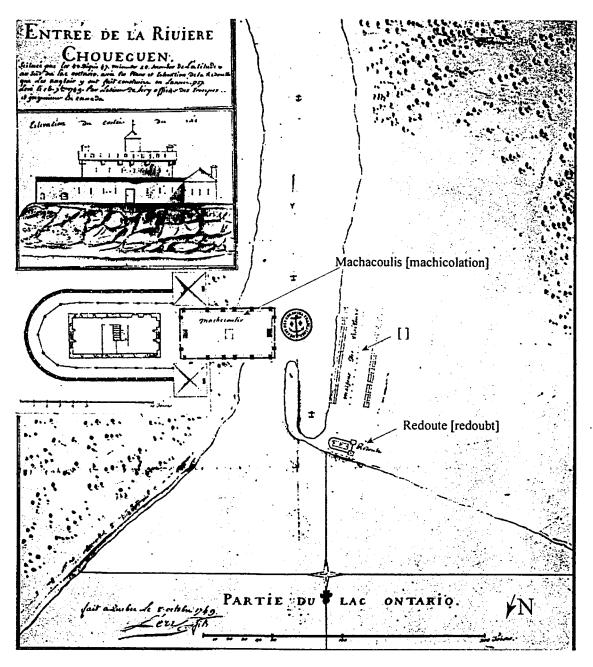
Plan, "Entrée de la Riuiere Choueguen," showing plan and elevation of Fort Oswego stone wall, Chaussegros De Lery, 1749 (Brackets, [ ], indicate that text was not legible). Reproduced from Frederick Zercher's master's thesis "The Economic Development," 37b. Original in the Paris Archives. Annotated by R. Hetzler, SUNY ESF, 2001.
